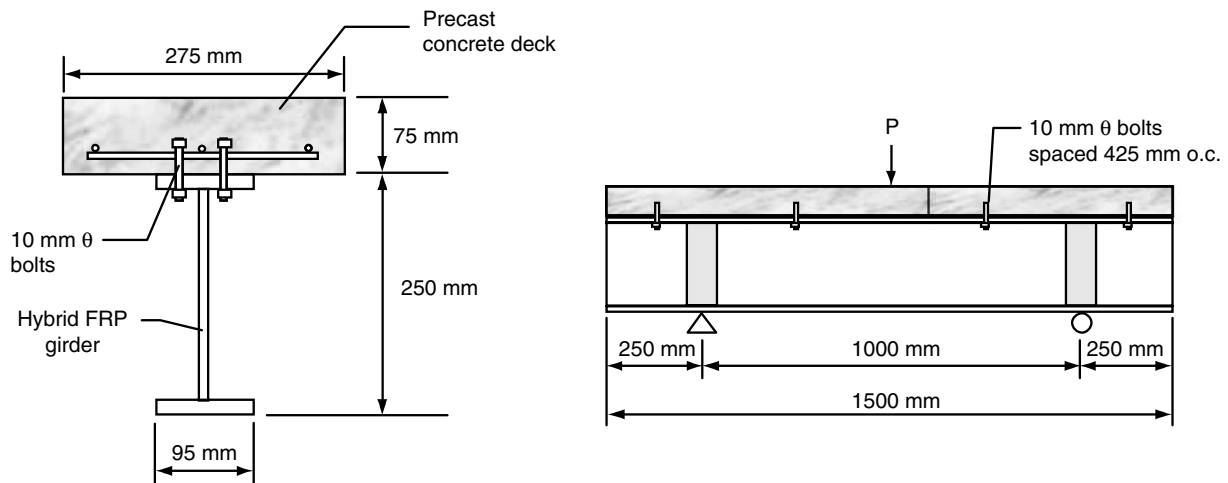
Specimen FRP-conc 1 dimensions and loading systems
